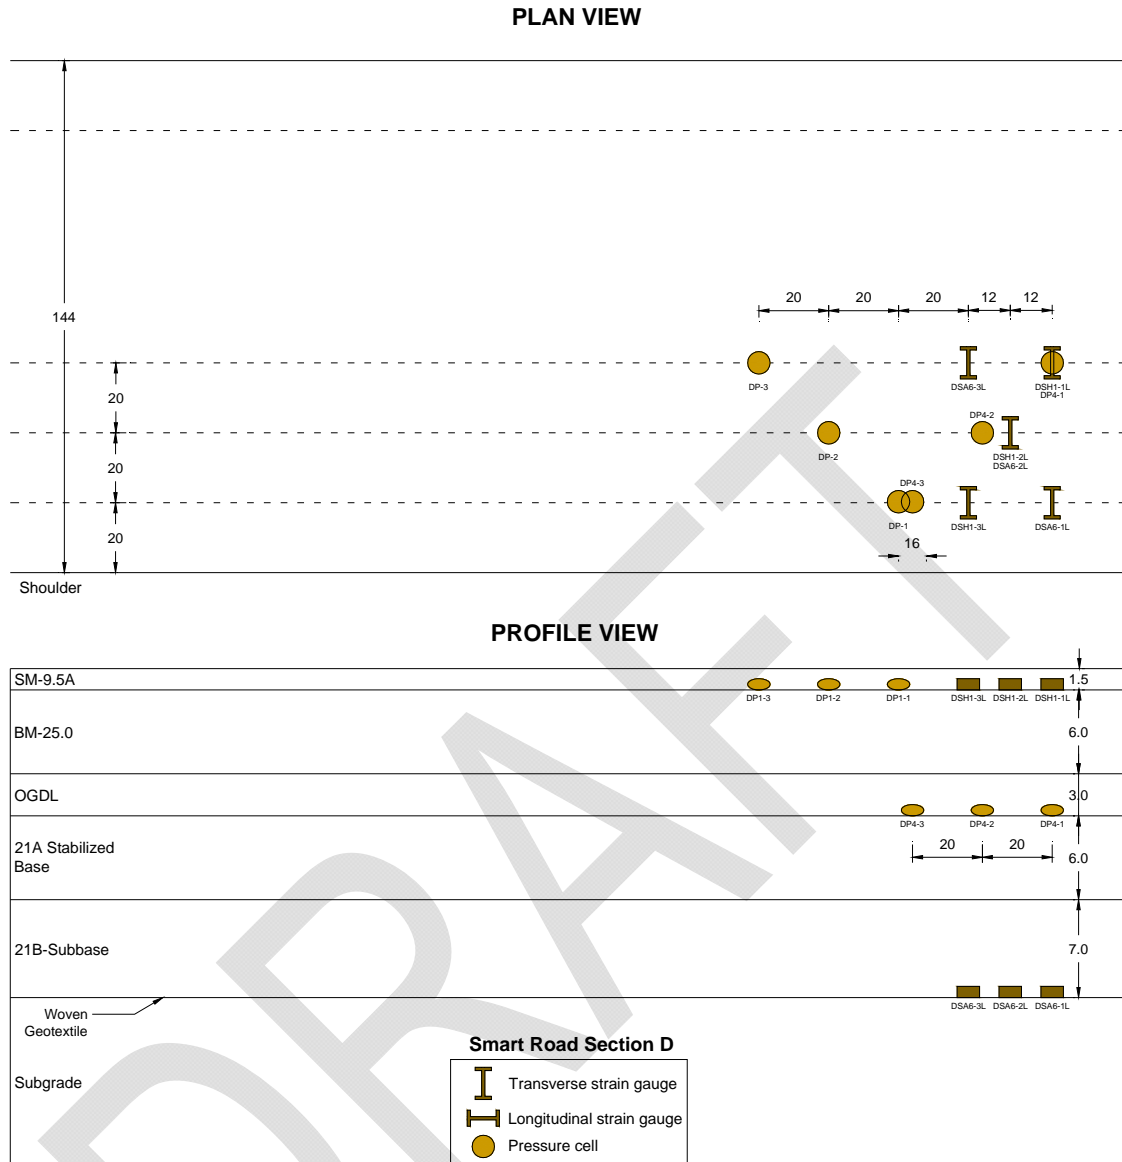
Plan and profile view of pavement structure and instrumentation of Section D, Virginia Smart Road
